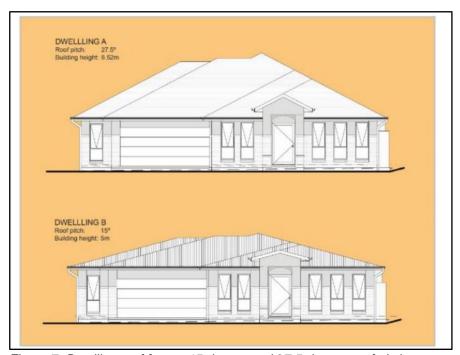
Dwelling roof forms, 15 degree and 27.5 degree roof pitches
